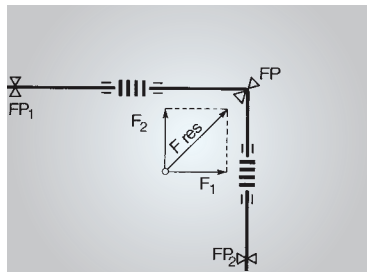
Bent system with axial expansion joints and elbow anchor
